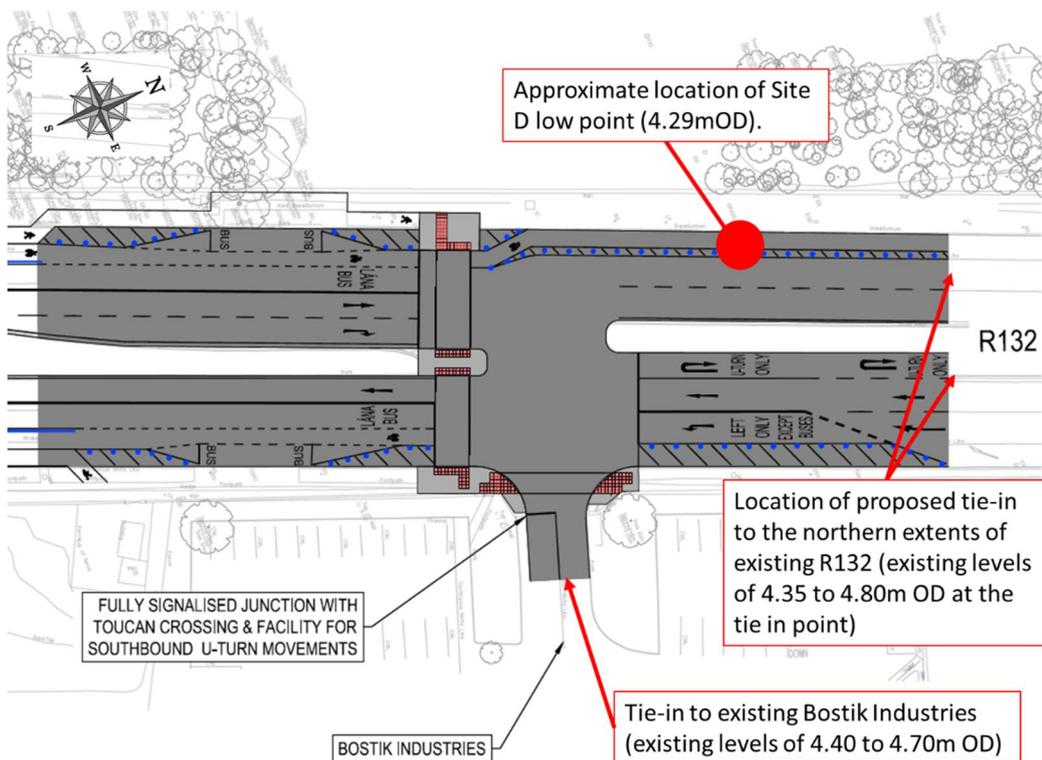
Tie-in Point to the Existing Roadway at Site D
